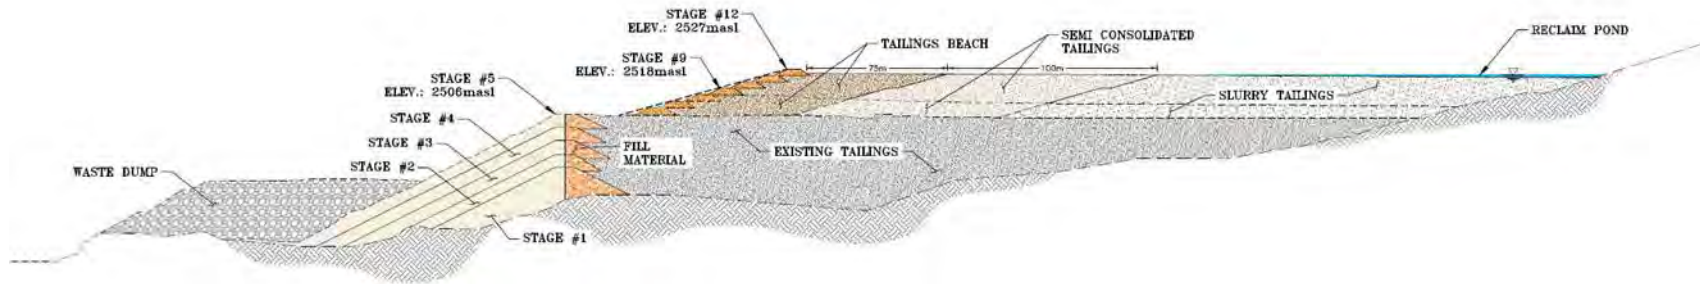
TSF Stages 6 through 12 Section View (Wood, 2020)
